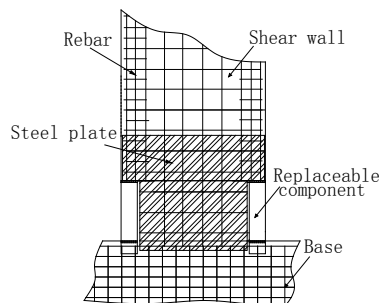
RC shear wall with replaceable components at two bottom corners
